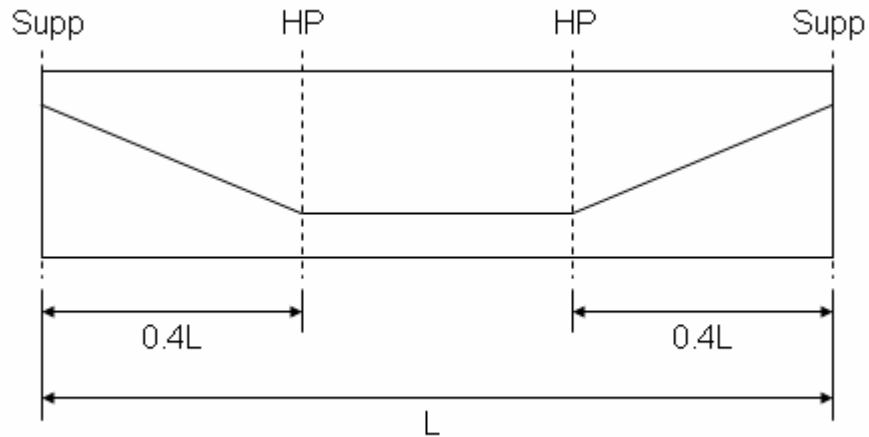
Layout of each Prestressed Concrete Girder in a Continuous Span
